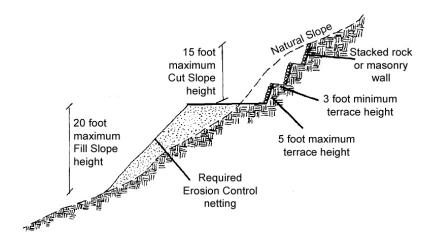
B.4.b Cut and Fill Slopes
